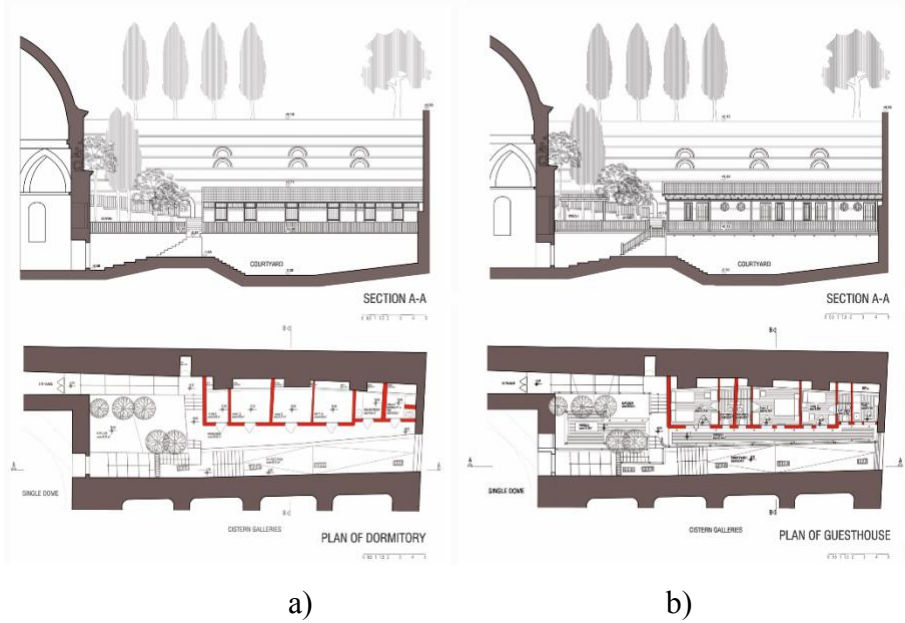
a) Plan and Facade of Workers' Dormitory b) Plan and Facade of Guest House (Archive of MSGSÜ Rectorate, Drawing: Dışkaya, H, Graphic Design: Eroğlu, İ.)
